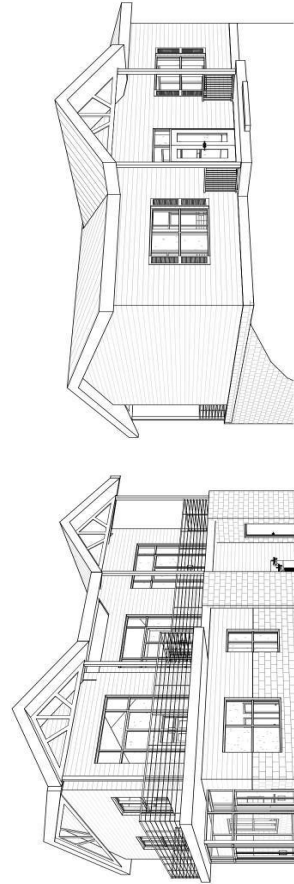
EXHIBIT F: CONCEPTUAL PLAN-NEW MARINA BUILDING
